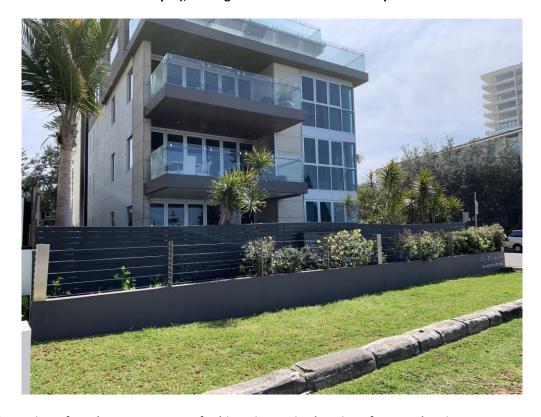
View of south-eastern corner of subject site, noting location of new pedestrian access gate and existing fence to be replaced, looking west from North Steyne
